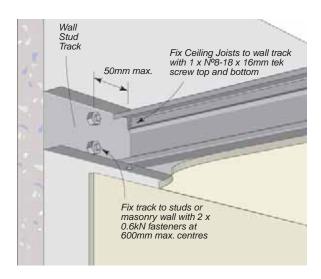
JOIST END SUPPORT MECHANICAL JOINT Maximum Joist Span: 6.0m (single span).
